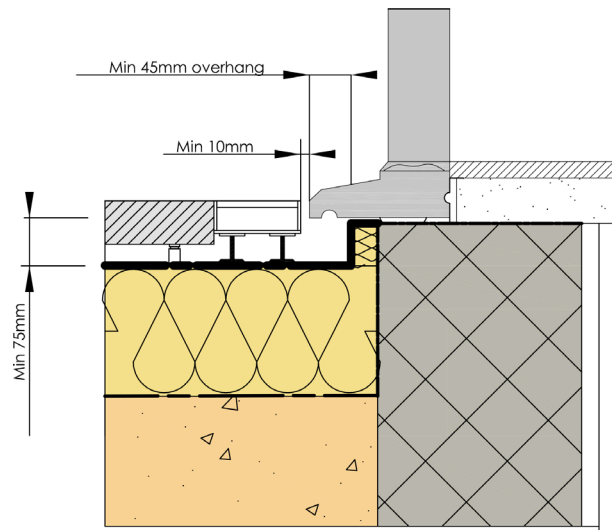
Upstand at door access: inverted warm deck roof / balcony
